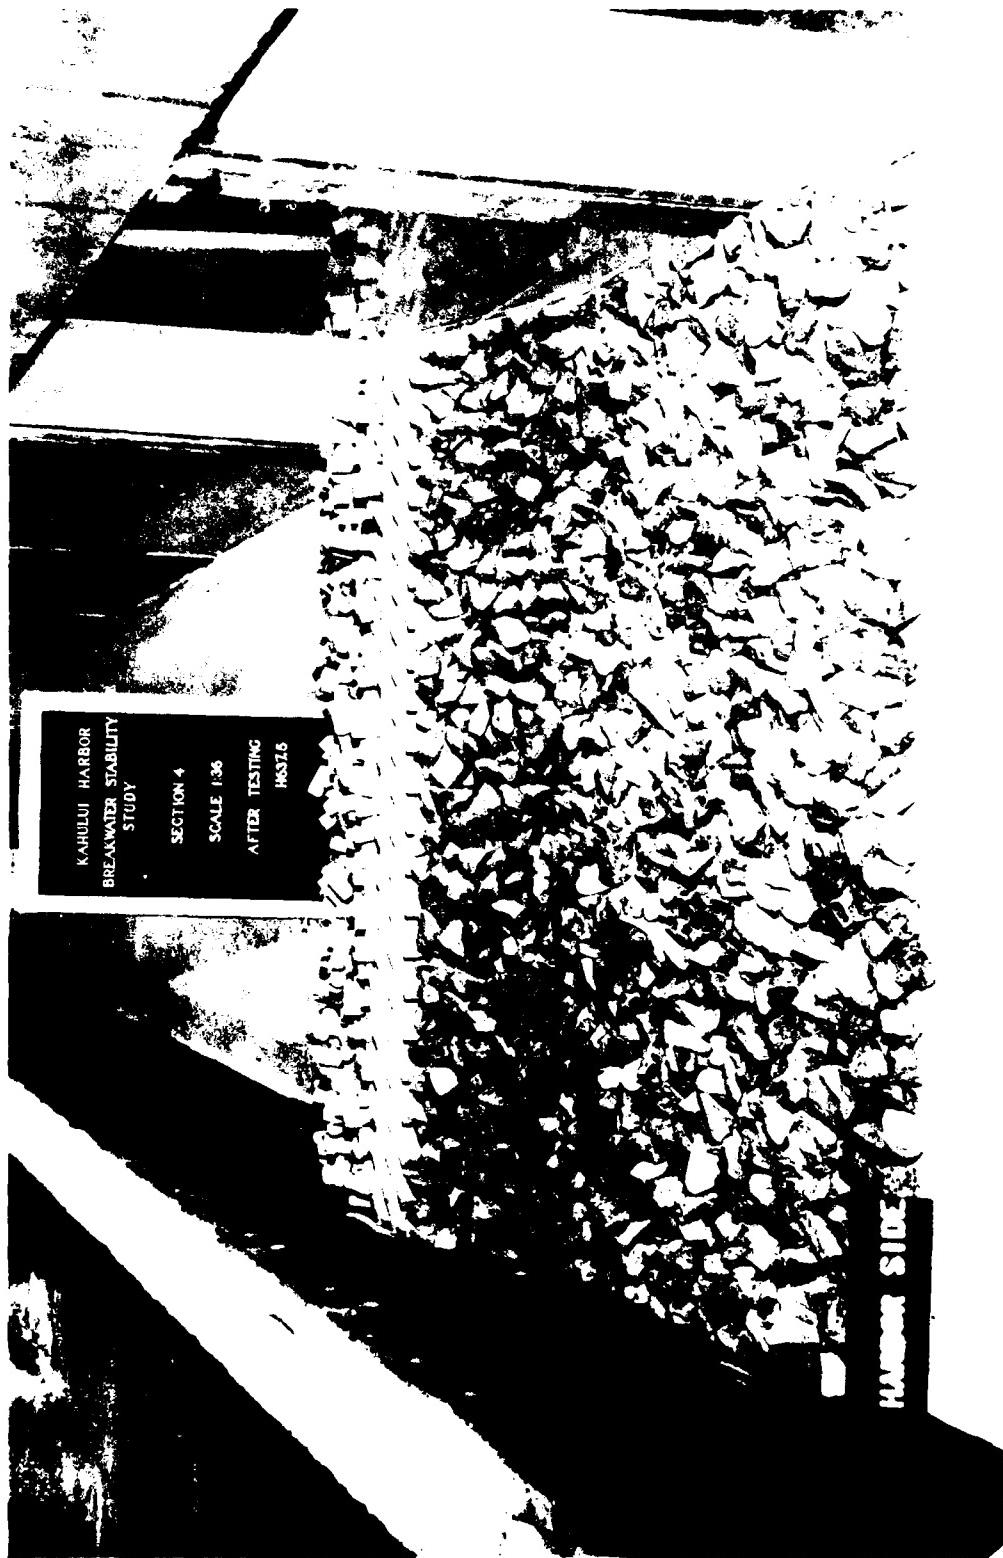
Harbor-side view of Plan 1 after testing, 1st test
